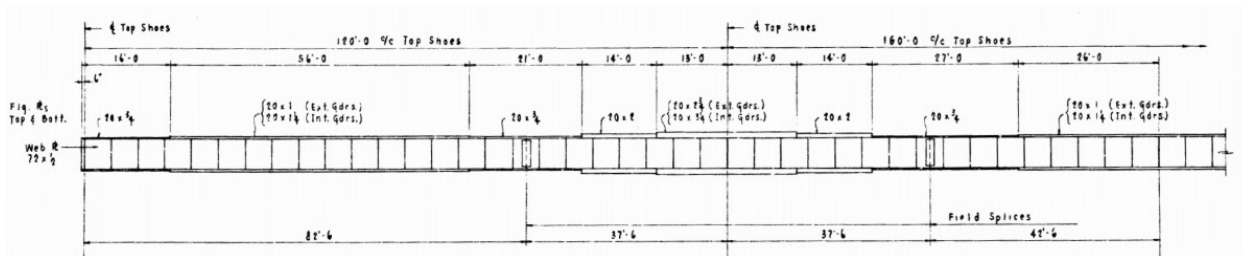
System B: Typical Plate Girder Elevation for Bridge (NBI 33240)
